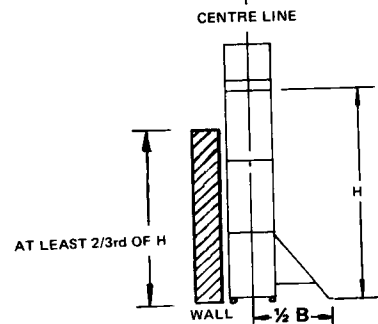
TOWER AGAINST BUILDING OR WALL WHICH IS AT LEAST TWO THIRDS OF MAX. PLATFORM HEIGHT
